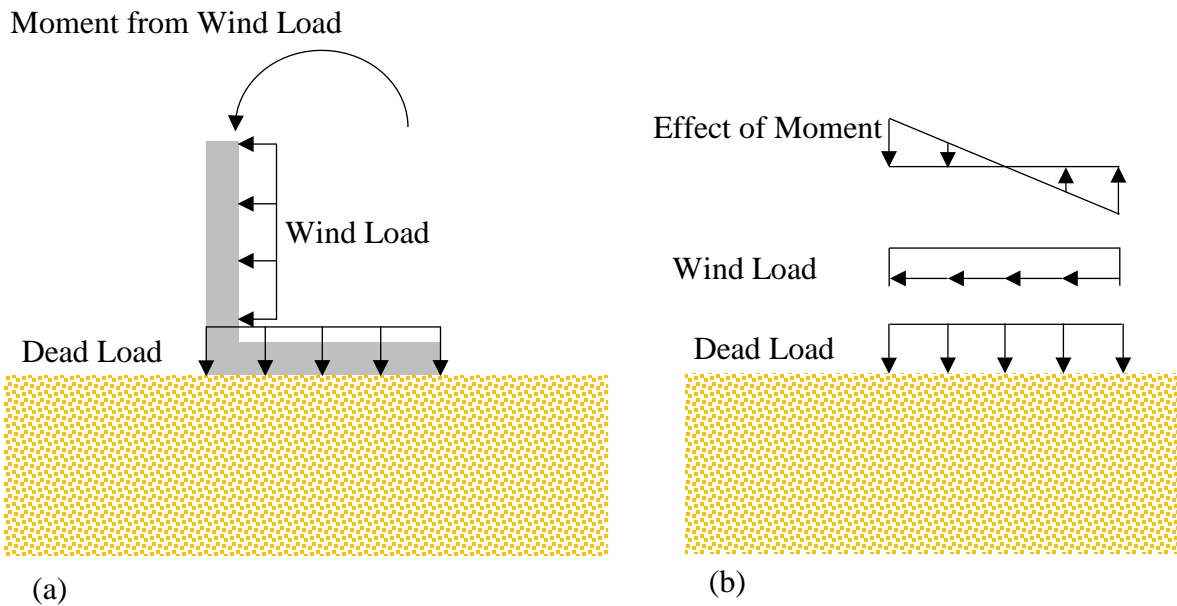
Noise wall system (a) external load sources from self-weight and wind and (b) loading effects from noise wall to underlying soil.
